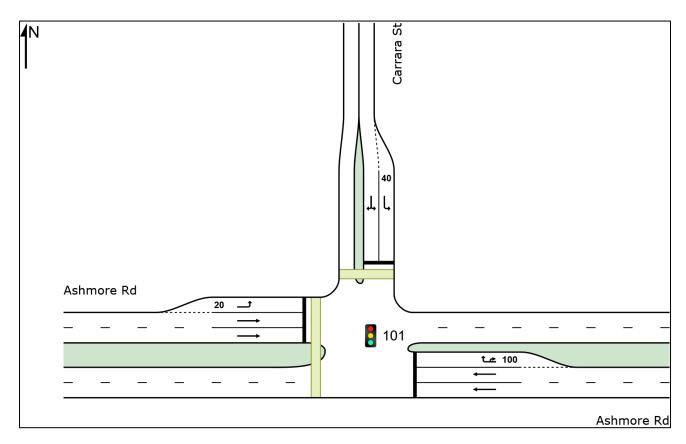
SIDRA intersection layout of Ashmore Road/ Carrara Street.
